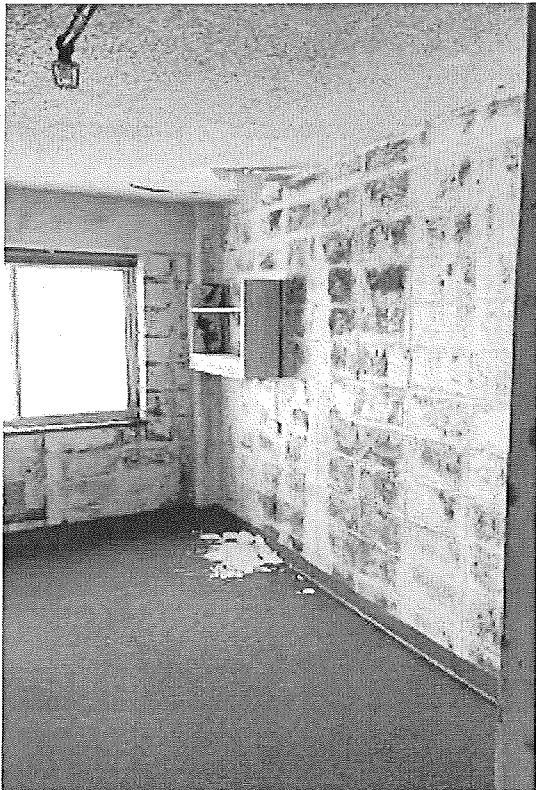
West Elevation Spalled Brick Veneer.
